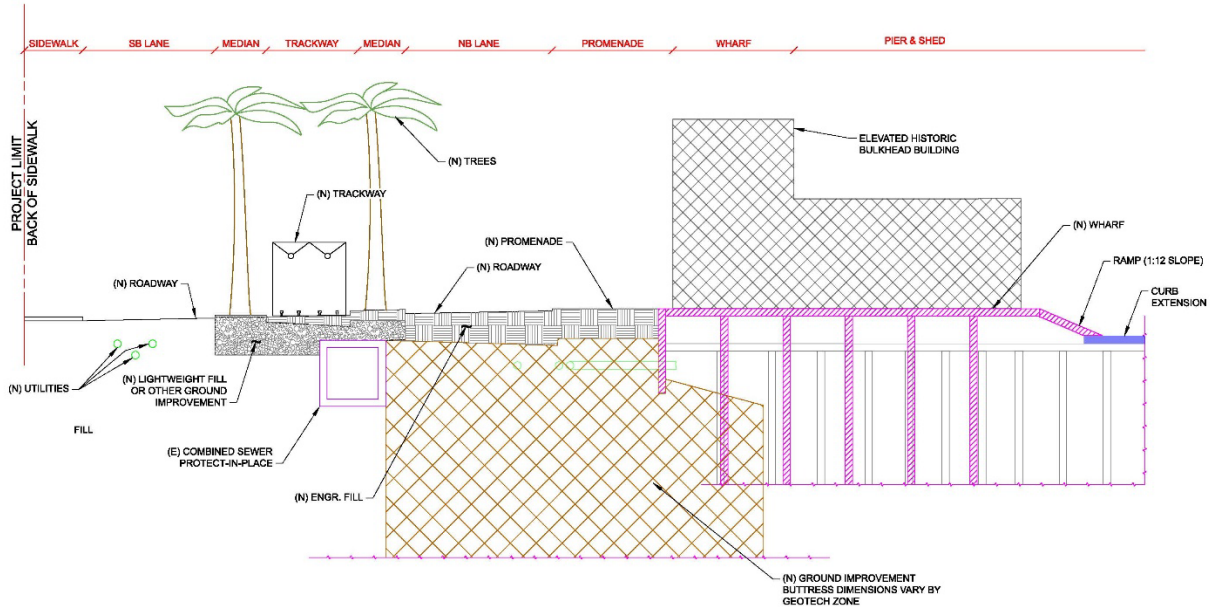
Section 2 Recommended Plan (Reach 2, Pier 3)
